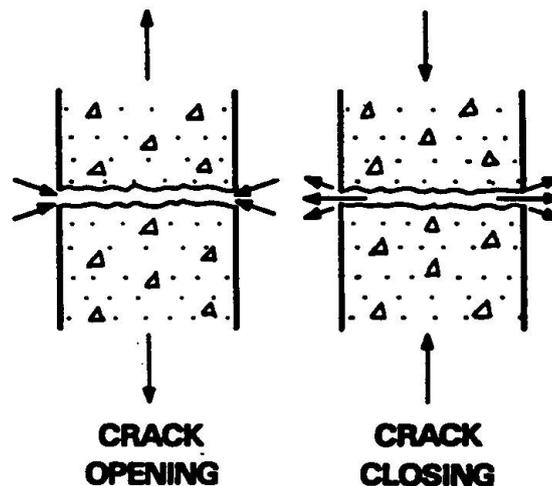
Pumping of Water in a Crack on Stress Reversal
